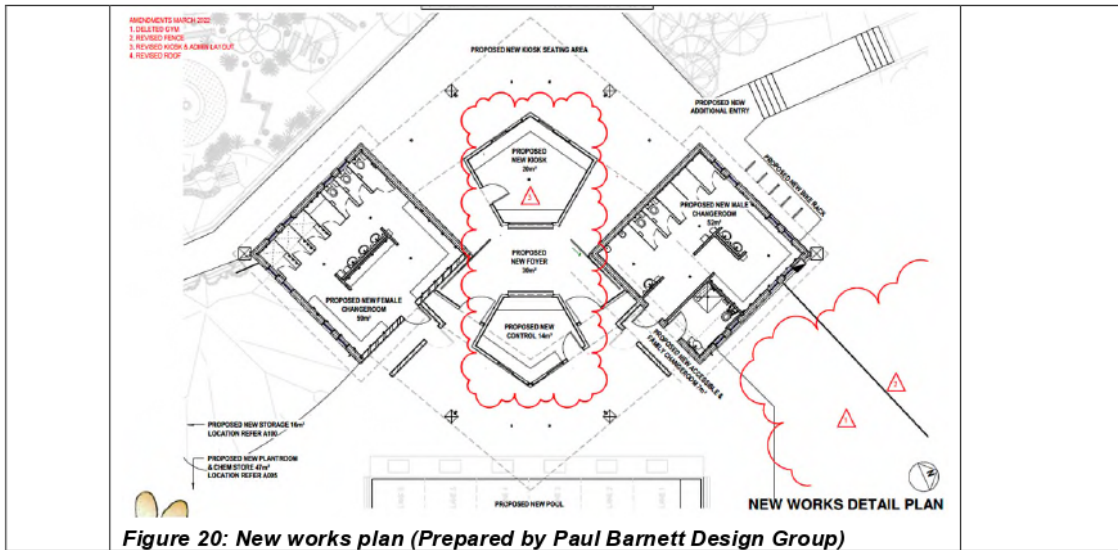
New works plan (Prepared by Paul Barnett Design Group)
